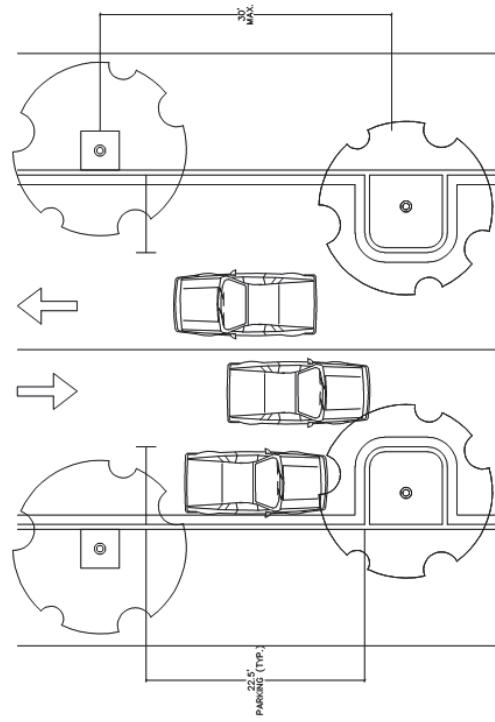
Downtown/Urban Street Example Section with Parking Both Sides
